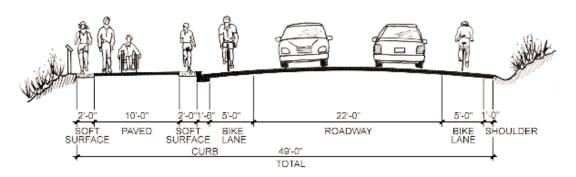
Proposed Development at Lincoln Boulevard at Pershing Drive North
